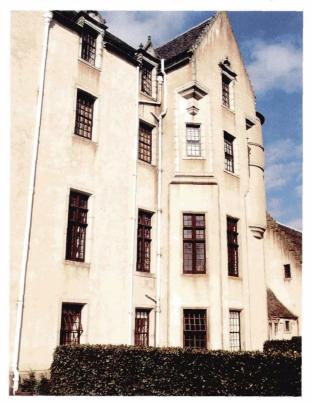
Detail of part of the west elevation of Keith Hall showing granite lintols, crow's step gable end and new rainwater discharge systems
